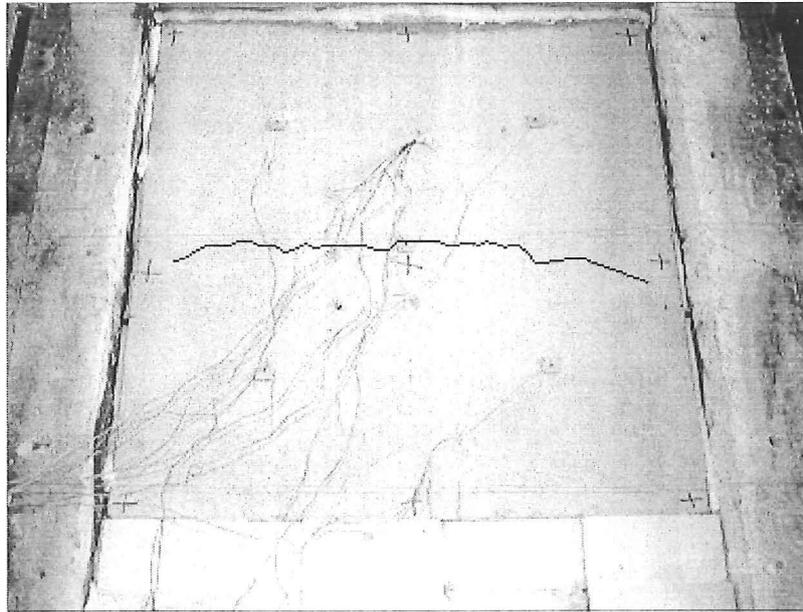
Crack across unexposed surface of 60mm high strength slab with fibres (photo at 50 minutes from test commencement)
